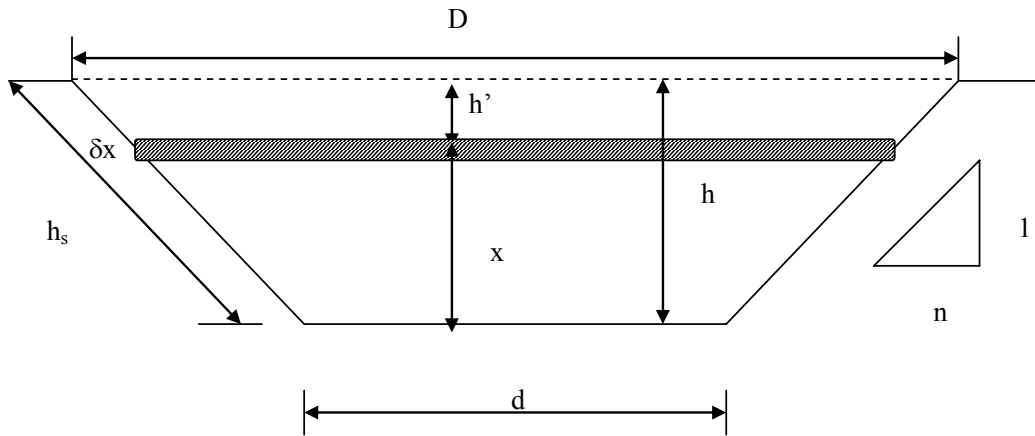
Cross-section of a “truncated-cone” shaped RHST (h_s = slanting height)
